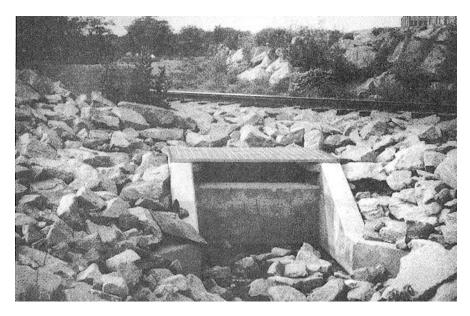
Headwall at inlet to culvert passing beneath a railroad bed.
